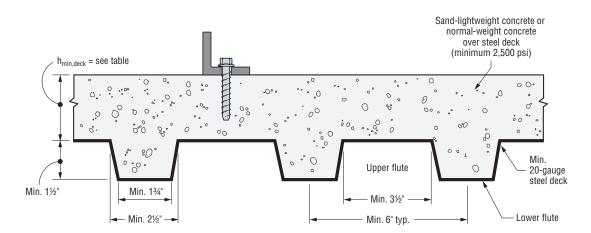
Installation of ¼"-, %"- and ½"-Diameter Anchors in the Topside of Concrete over Steel Deck
